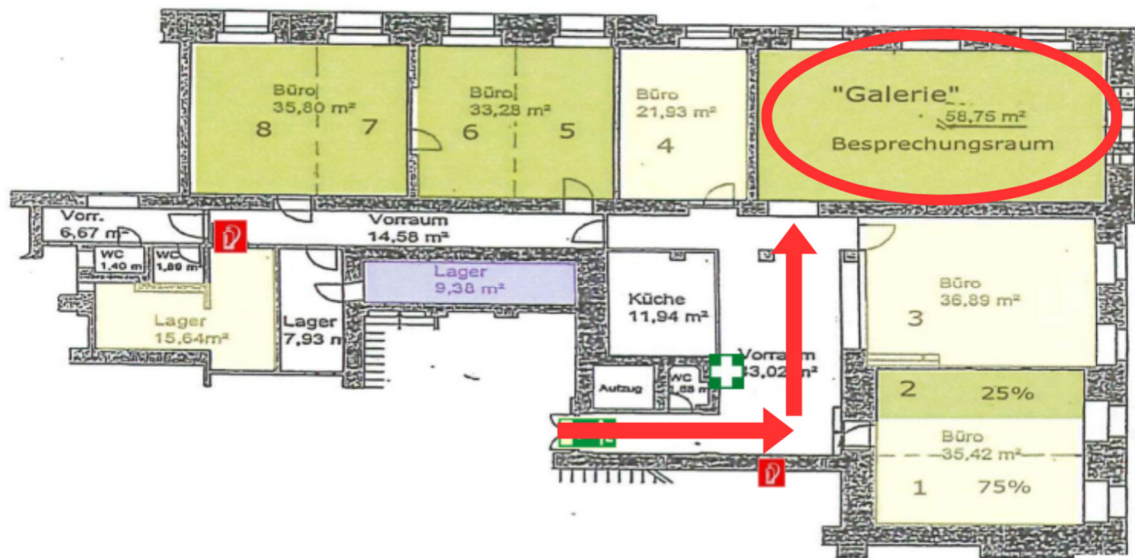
Floor plan, Universitätsstraße 5, mezzanine floor: gallery
